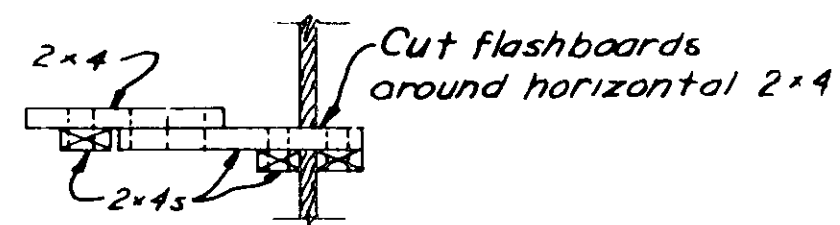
DETAIL ELEVATION OF FLASHBOARD FRAMES
